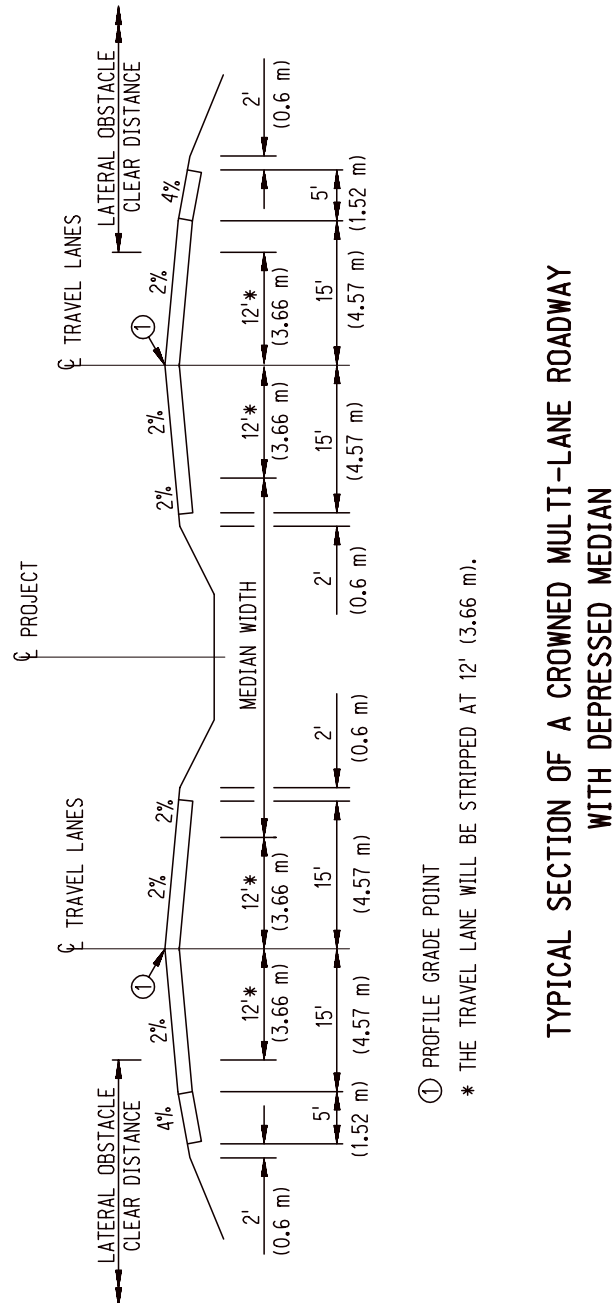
Roadway Cross-Section Elements - New and Reconstructed
